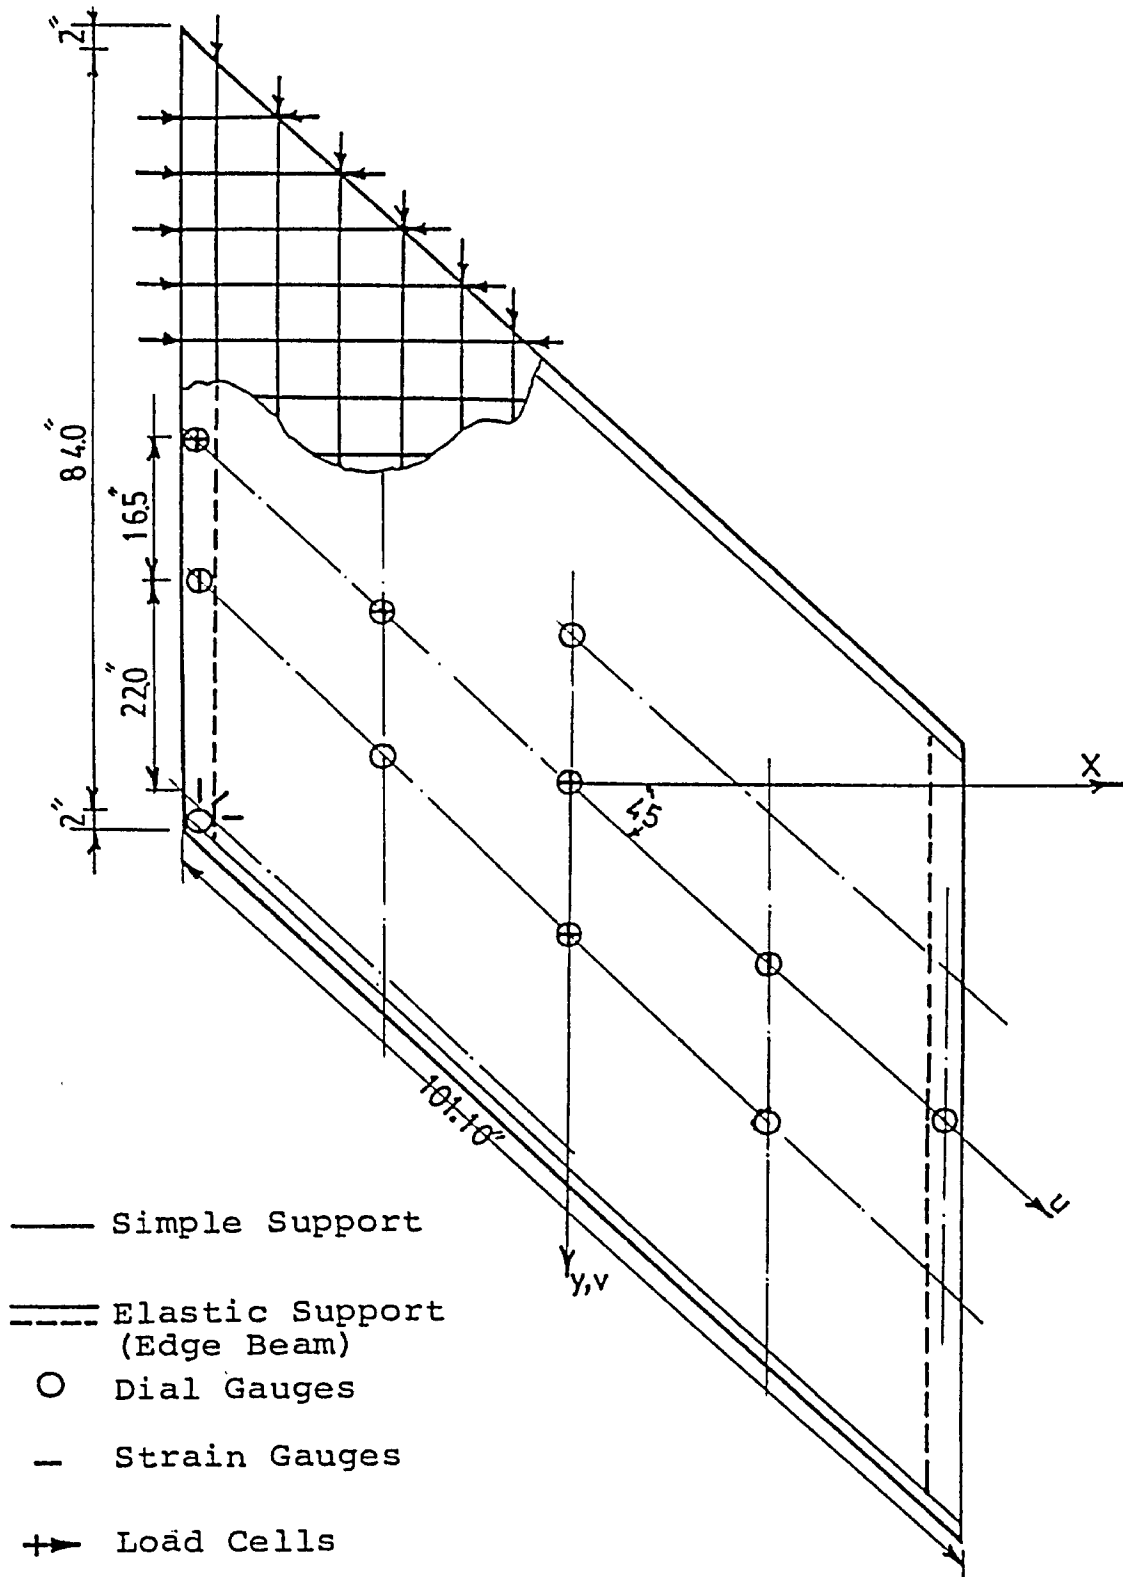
PRESTRESSED CONCRETE WAFFLE SLAB B.2.
